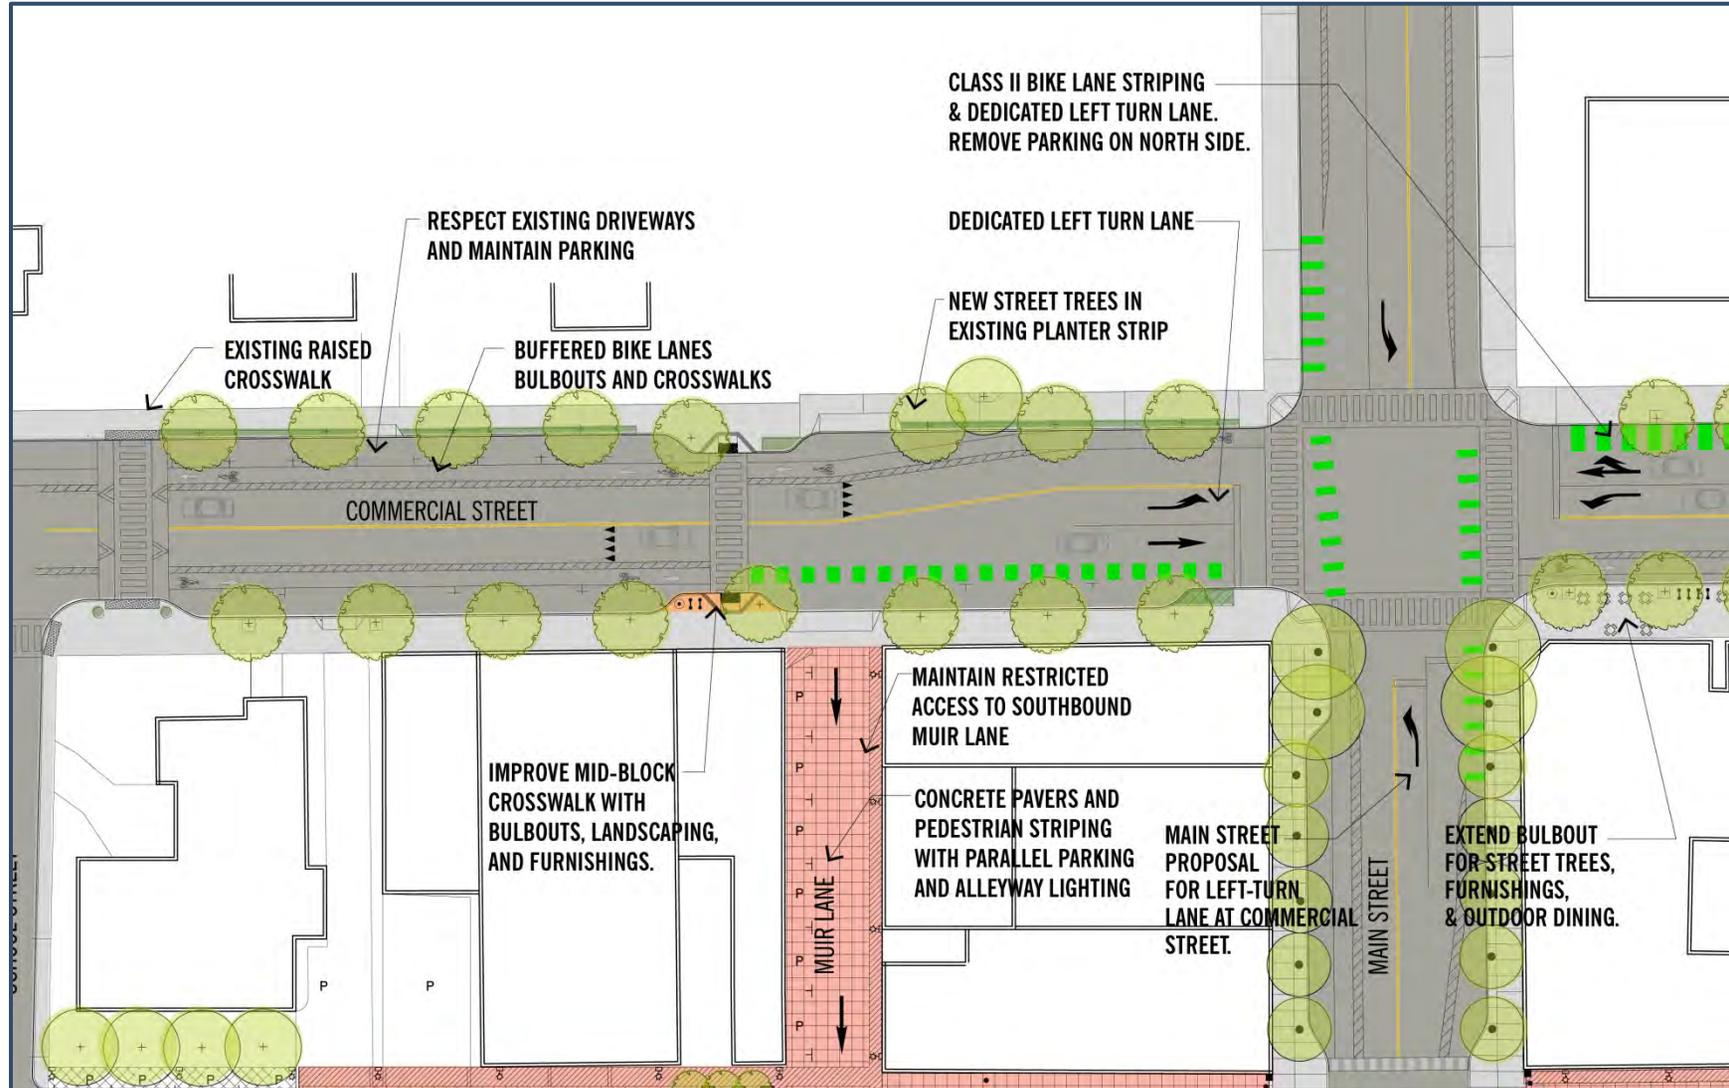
Commercial Street at Main Street Intersection (West Commercial Street with Parallel Parking)
